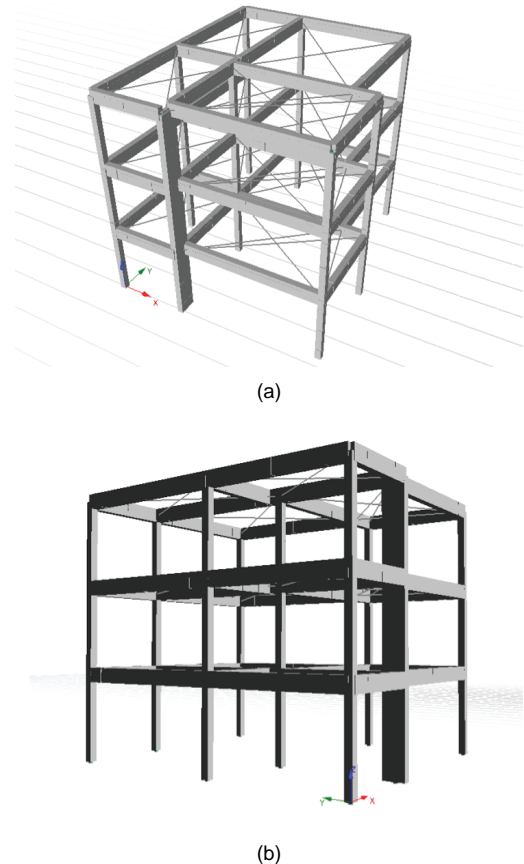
Overview of the building: rendered views of the finite element model used to reproduce the full scale test
